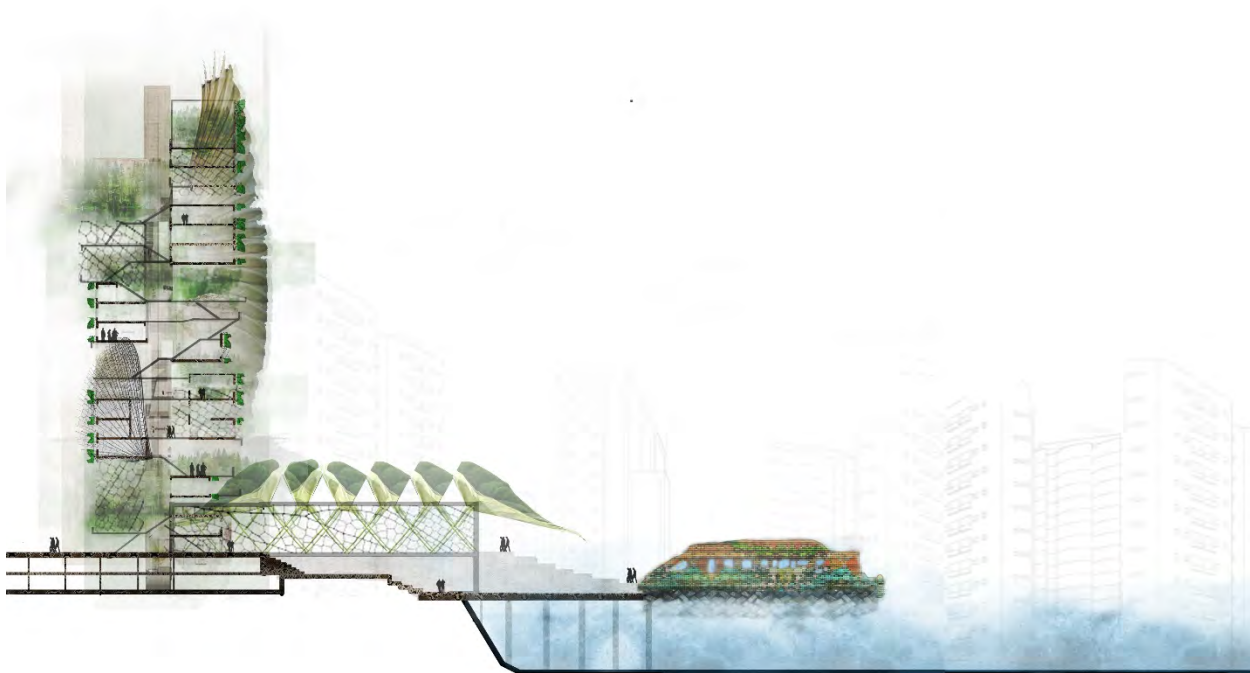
Student Work: Building/Site Section Source: (Samantha Jesser, University of Idaho)
